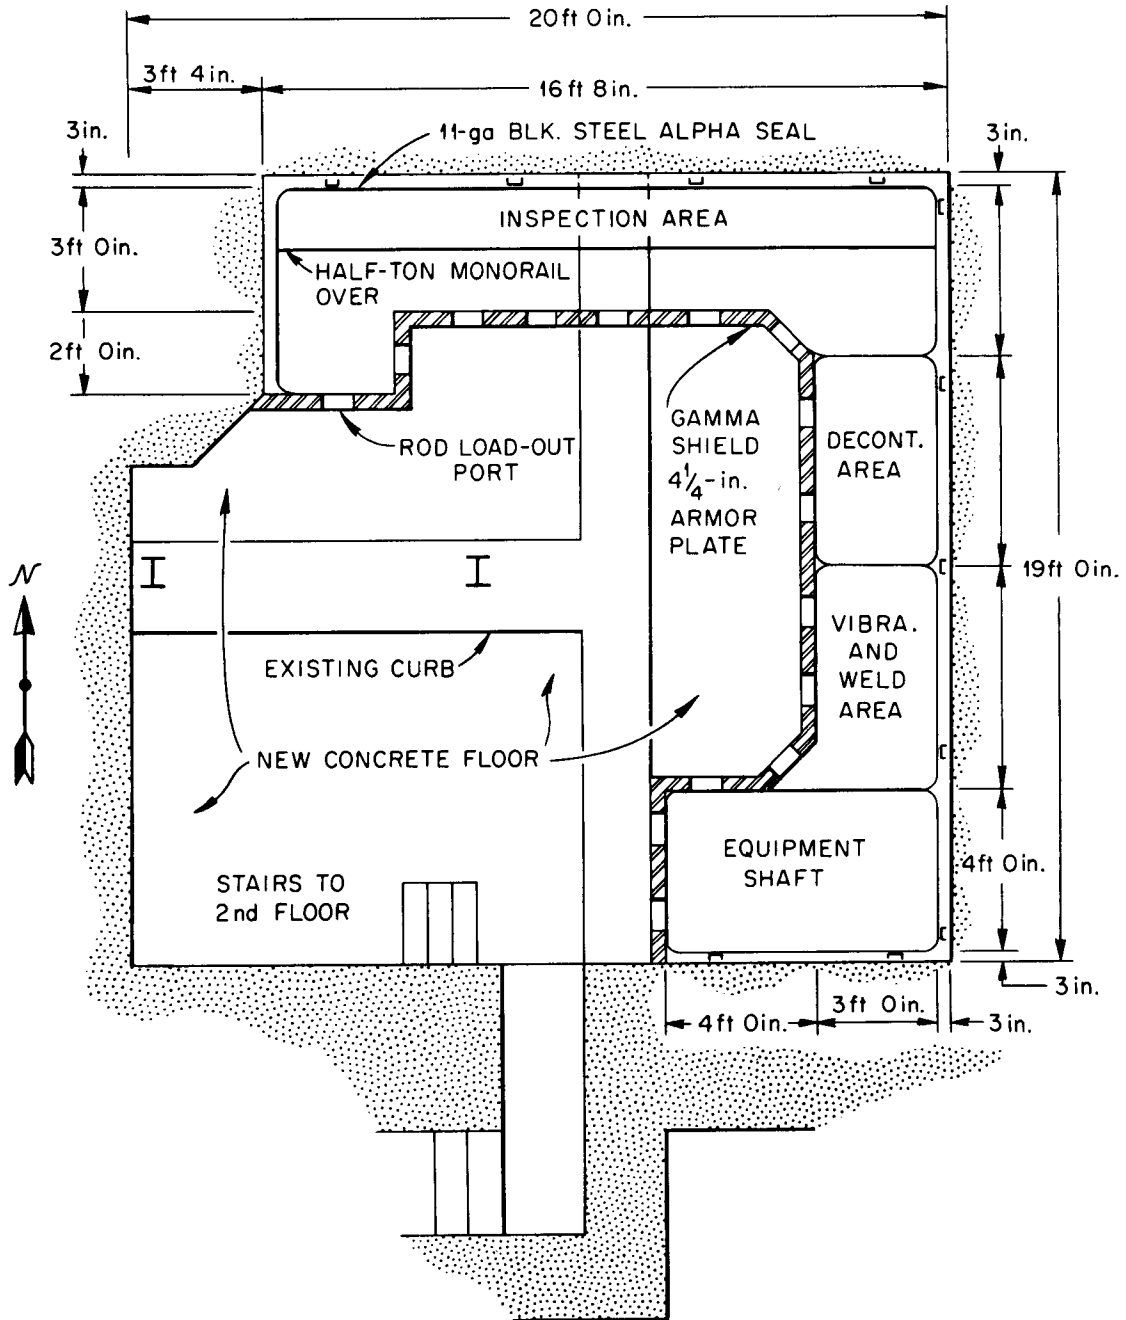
First Floor Plan - Rod Fabrication Facility.
